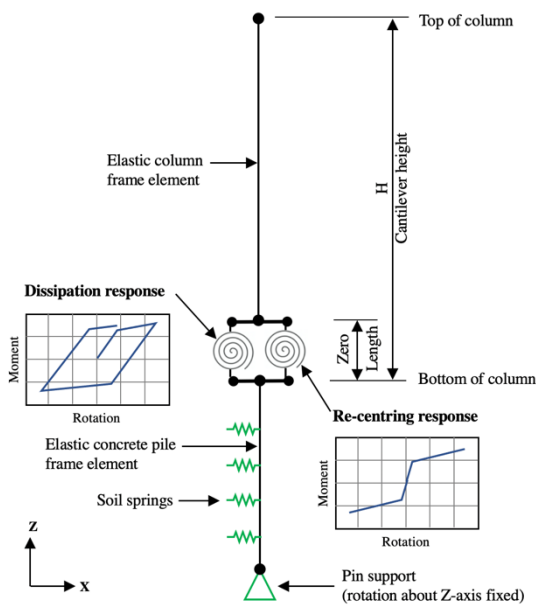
Rotational spring model with two rotational springs in parallel adopted for the cantilever bridge pier with DCR joint at the column-pile connection.
